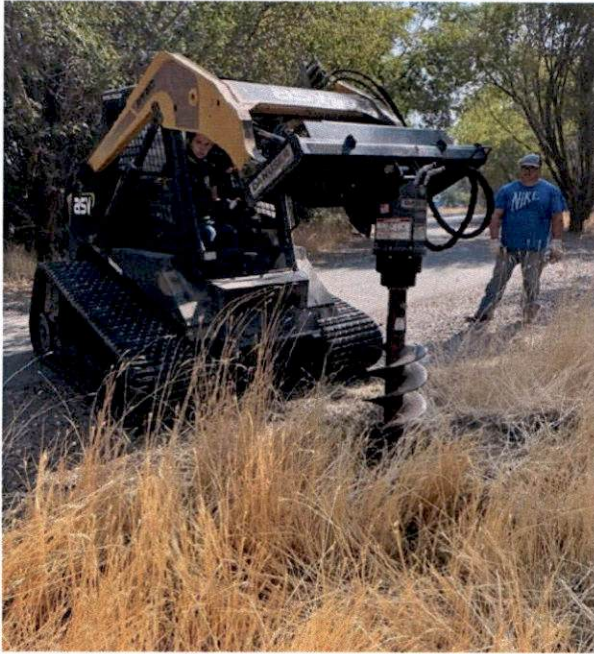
14th Street API. Proposed Kiosk #2 location off paved trail. View to the north.
